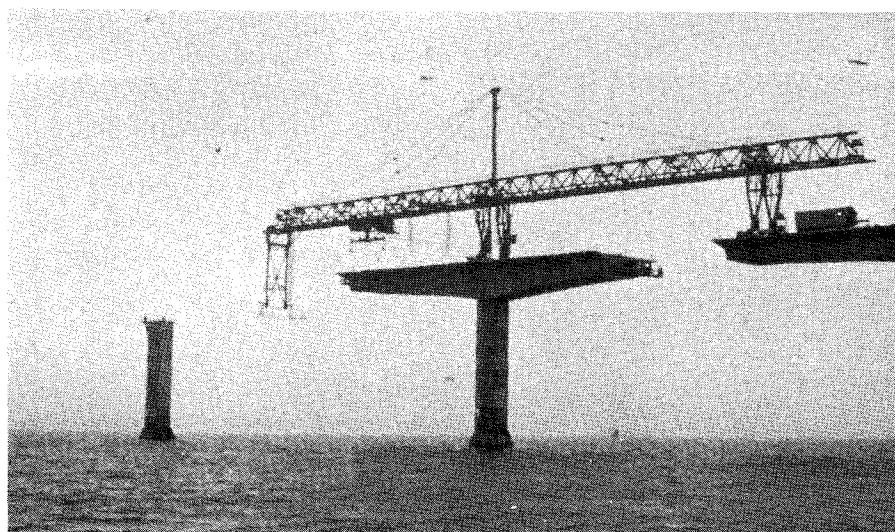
Sallingsund Bridge, Denmark, showing balanced cantilever construction.
